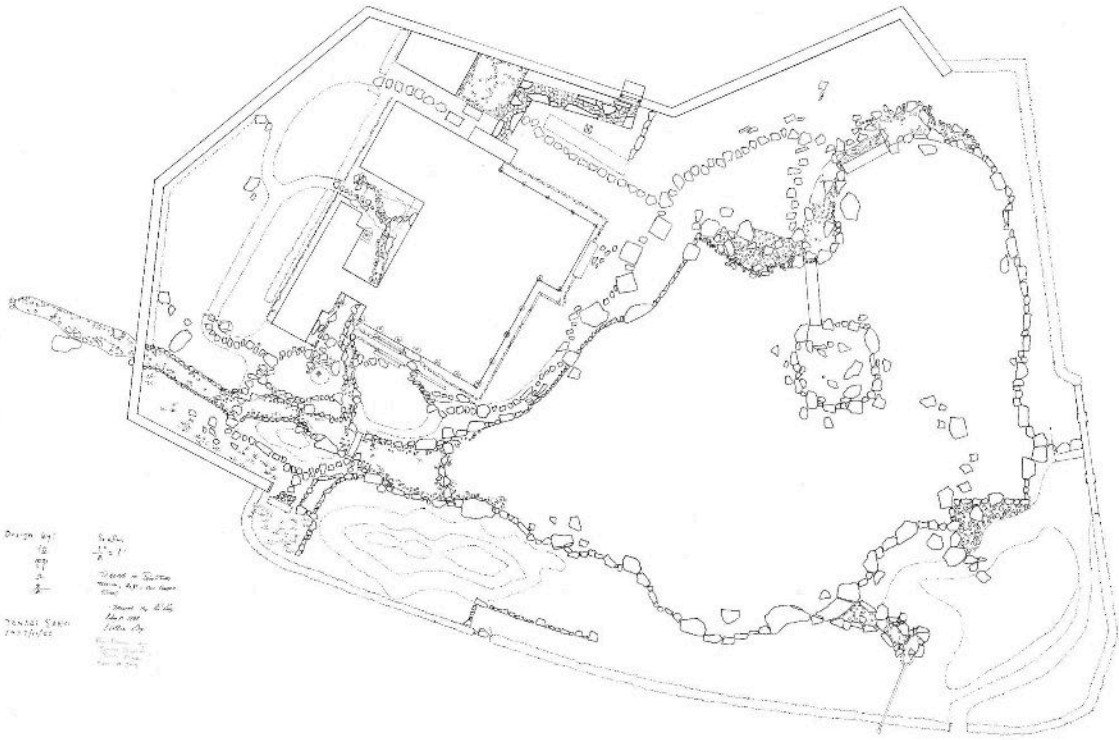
Shofu-so Garden Plan by Tansai Sano (1957) Courtesy to the Shofuso Japanese Cultural Center
